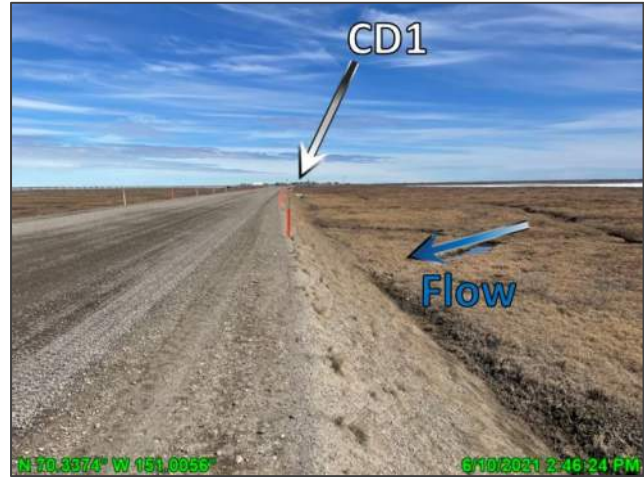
CD2 road embankment in the vicinity of culvert CD2-16, looking southeast; June 10, 2021
